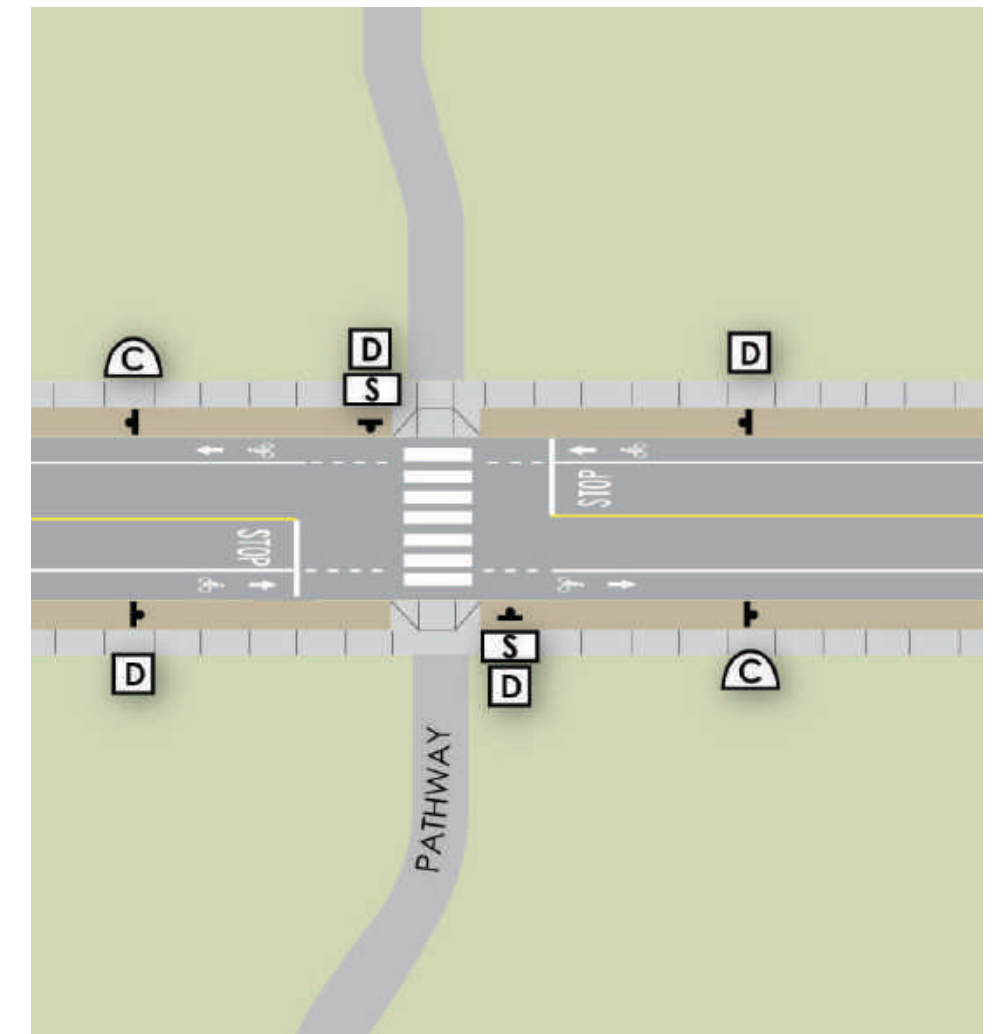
Typical Decision (D), Confirmation (C), and Street Name (S) sign placement where a trail intersects a roadway midblock and connects to on street bicycle or pedestrian routes.
